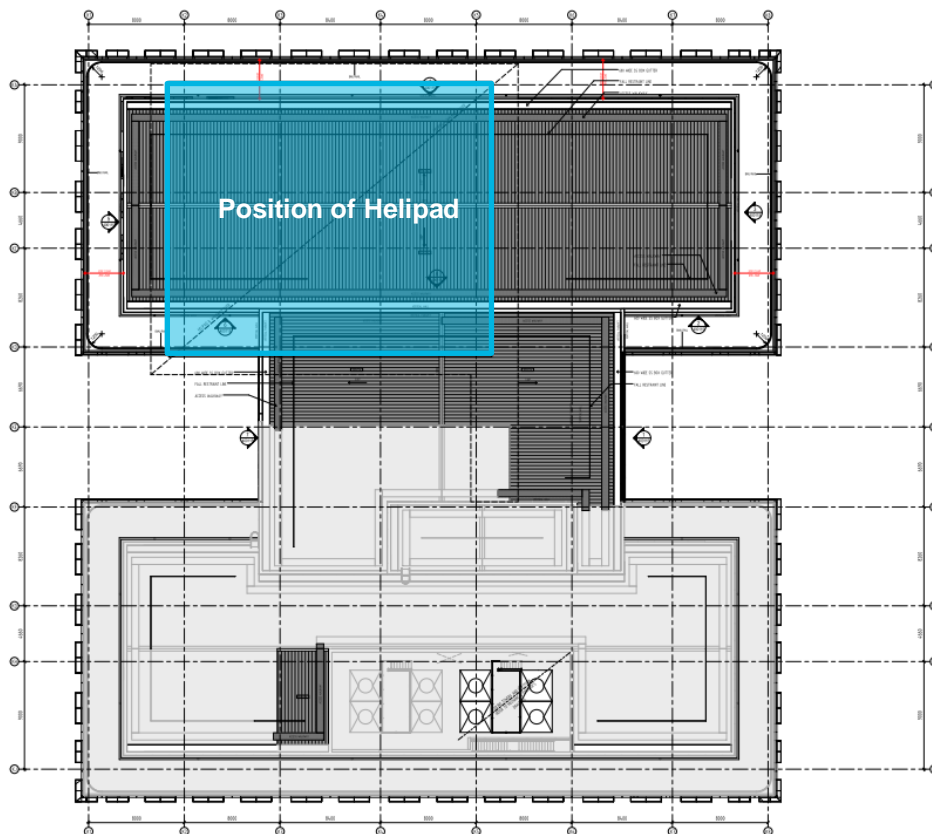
Helipad position above Building K rooftop at Royal Hobart Hospital
